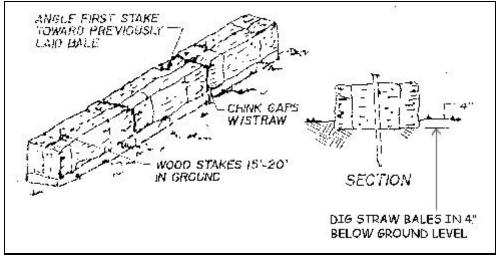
Detail of straw bale filter installation (Source: CBBEL files)
